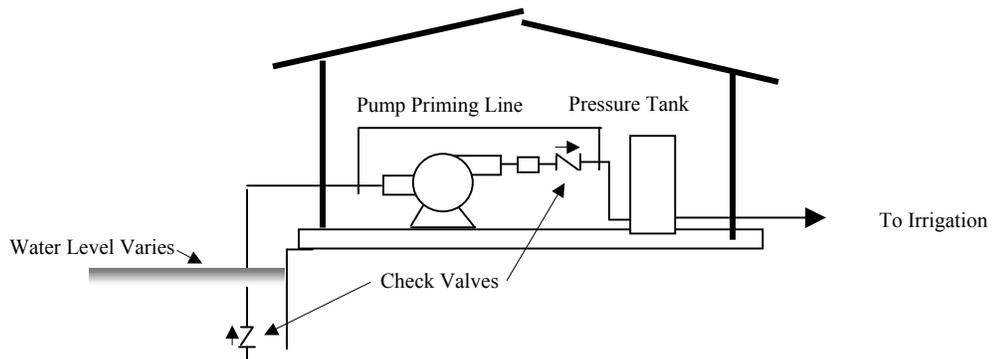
Boat Maintenance Pump System Piping Arrangement
